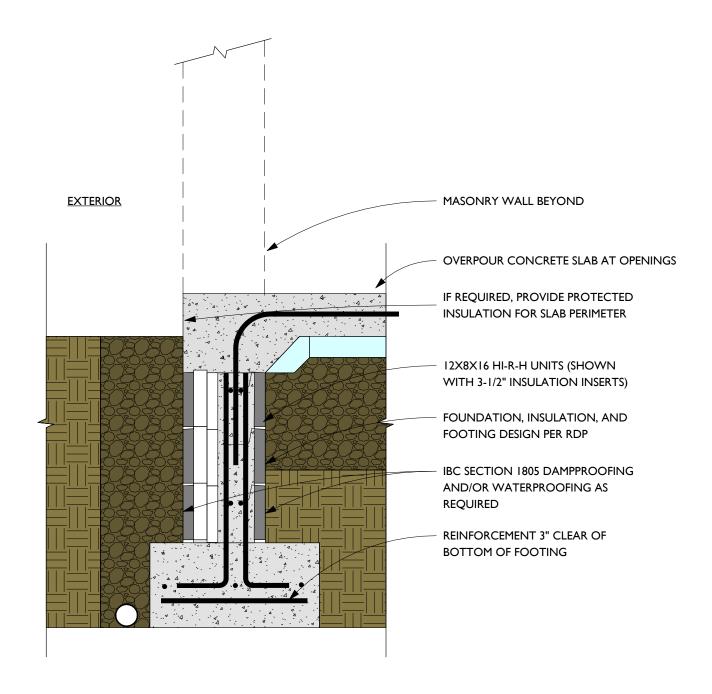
CMU - Concrete Foundation - Loading Dock
